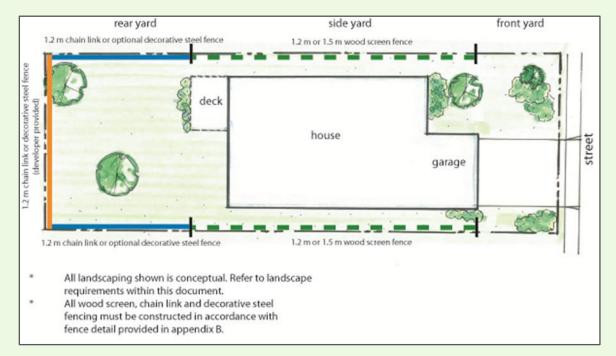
Fencing Plan – Stormwater Management Facility, Ivor Dent Sports Park, and Neighborhood Parks and Walkway Lots
